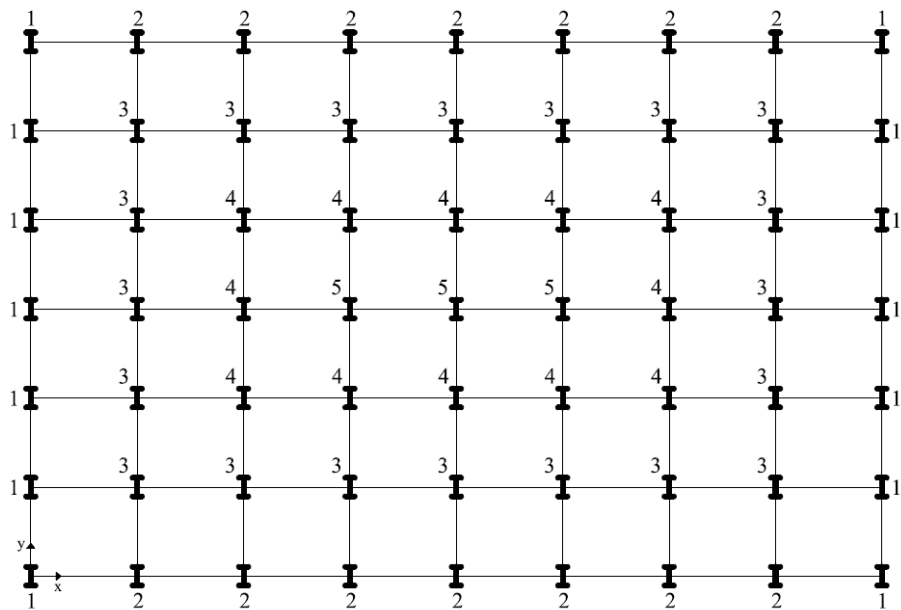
Column grouping in plan level for 3860-member steel frame
